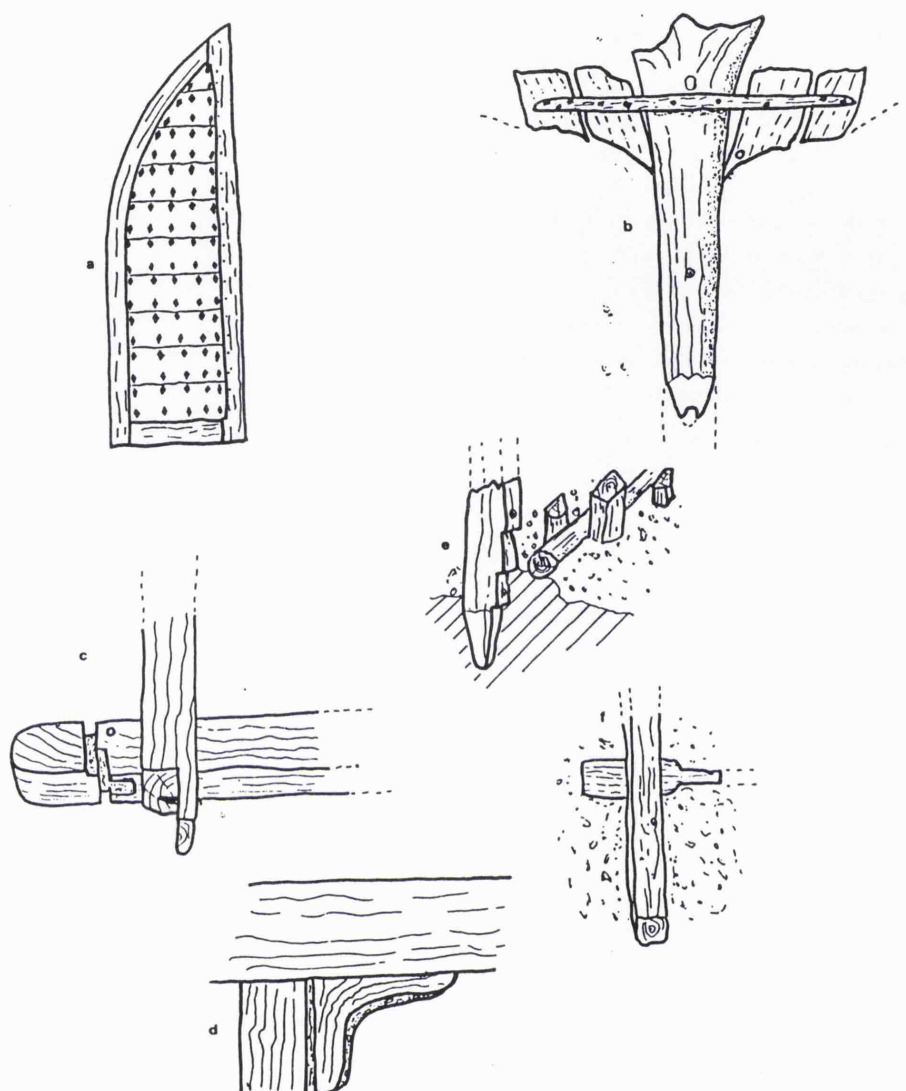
Sketches of building timbers with nautical features or origins. A) Half a C15th door from Norwich Cathedral after Hewett 1985 . B) C10th arcade post and arch filling planking with Graveney style rove nails from Vintners Place, London. C) Corner joint in medieval building sill beam, the lower timber was a ship head beam, Bryggen after Christensen 1985. D) Ship knee timber as commonly reused in C18th buildings at Chatham and Portsmouth Naval dockyards. E) Late-Saxon Clinker boat frame timber reused in a probable wall foundation at Bull Wharf. F) Pre-Conquest oar or paddle blade reused as a bearer under a floor joist at Bull Wharf.
